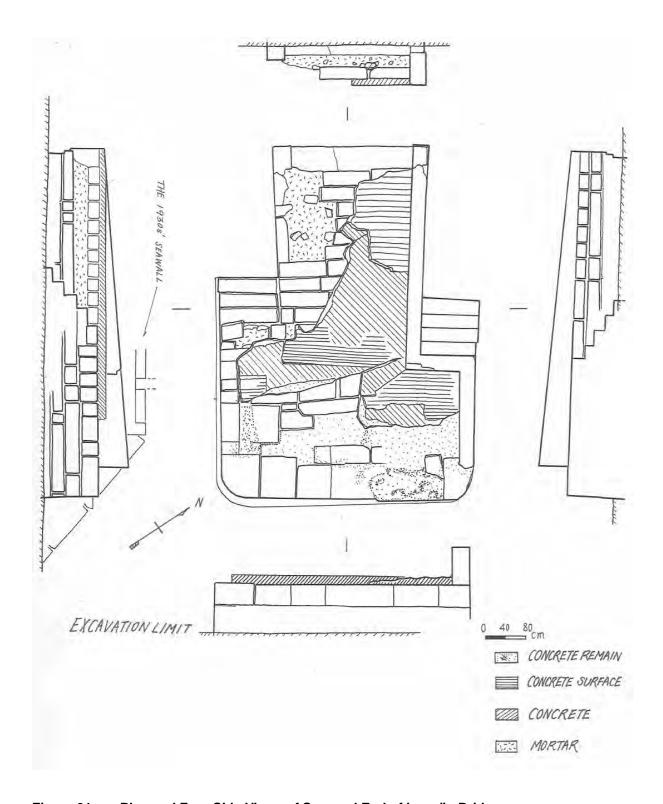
Plan and Four Side Views of Seaward End of Longjin Bridge
